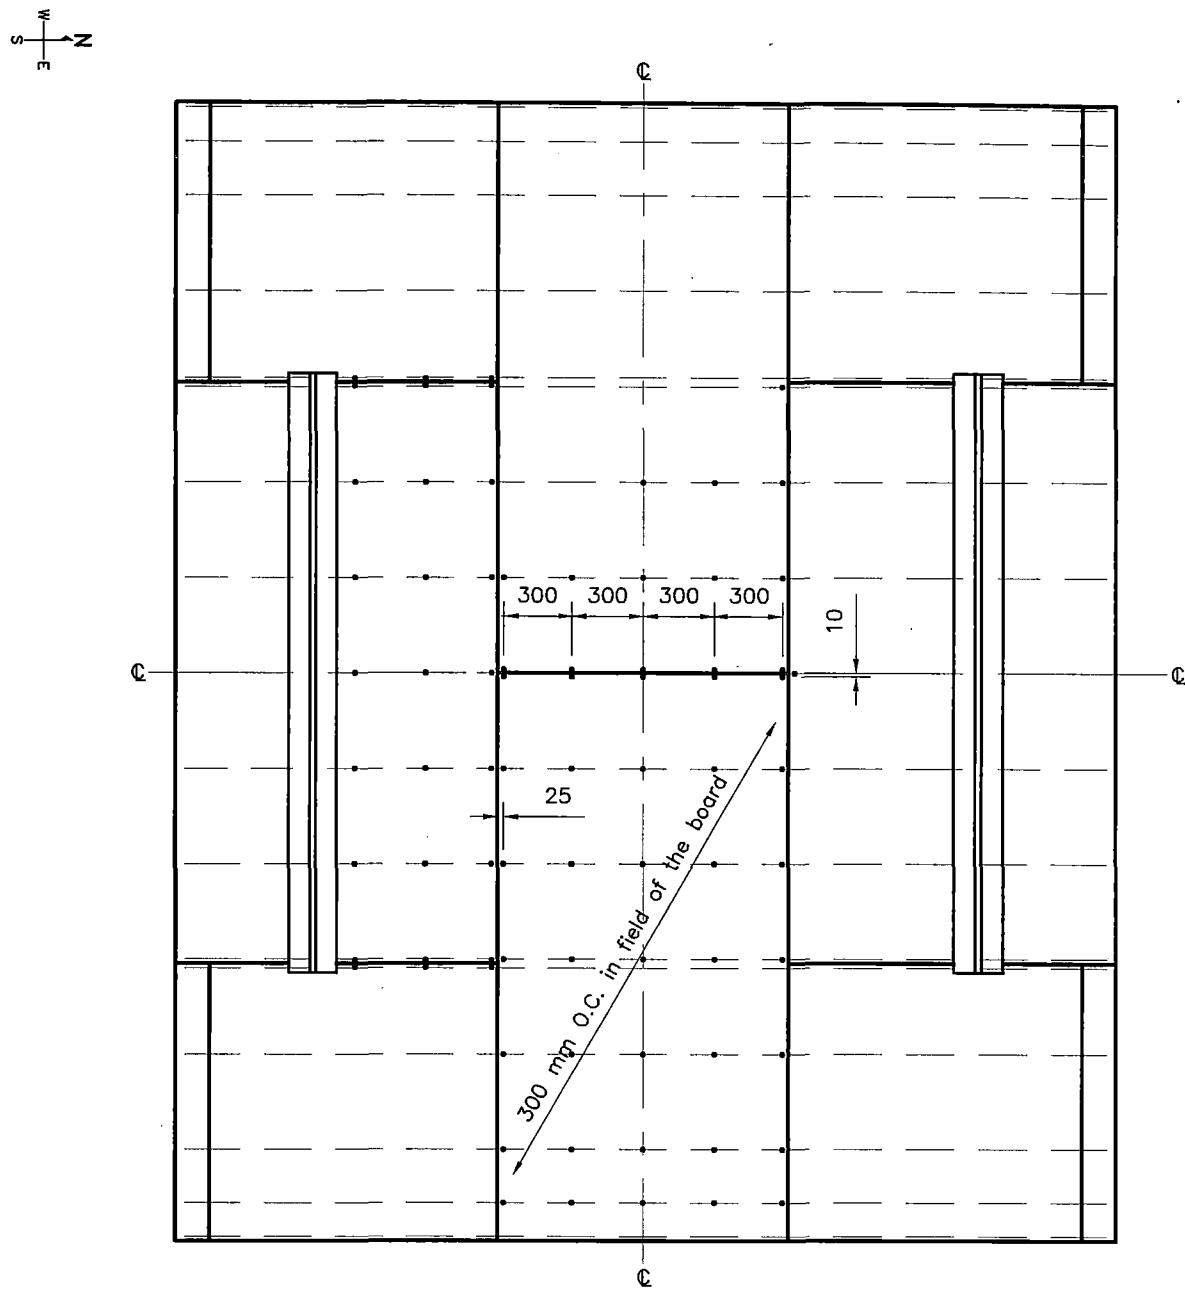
Assembly No. 2, Plywood Subfloor Arrangement
